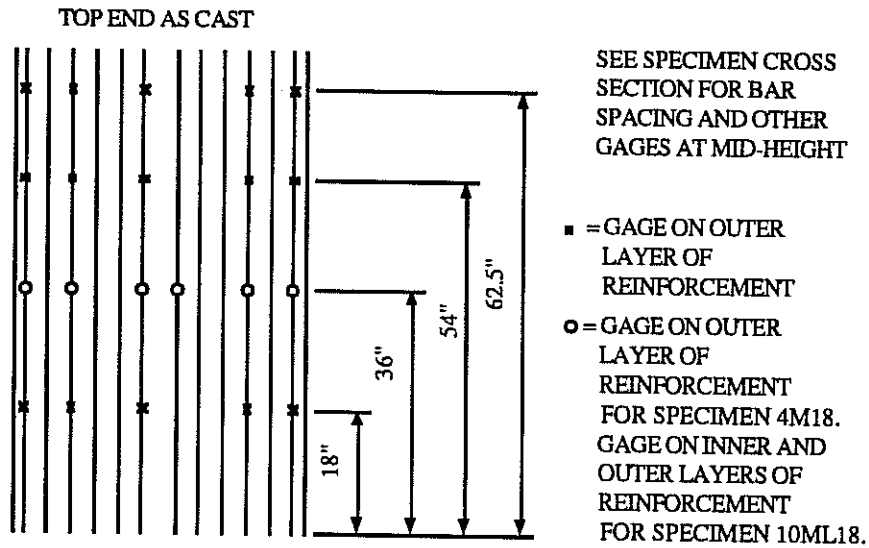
Gage Positions on Compression Face, Specimens 4M18 and 10ML18
